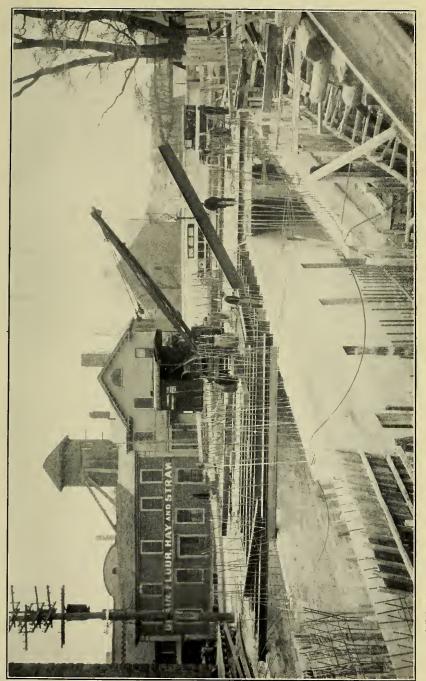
PLATE VI.—VIEW SHOWING CONSTRUCTION OF NEW BRIDGE AT ADAMS STREET, MILTON.
